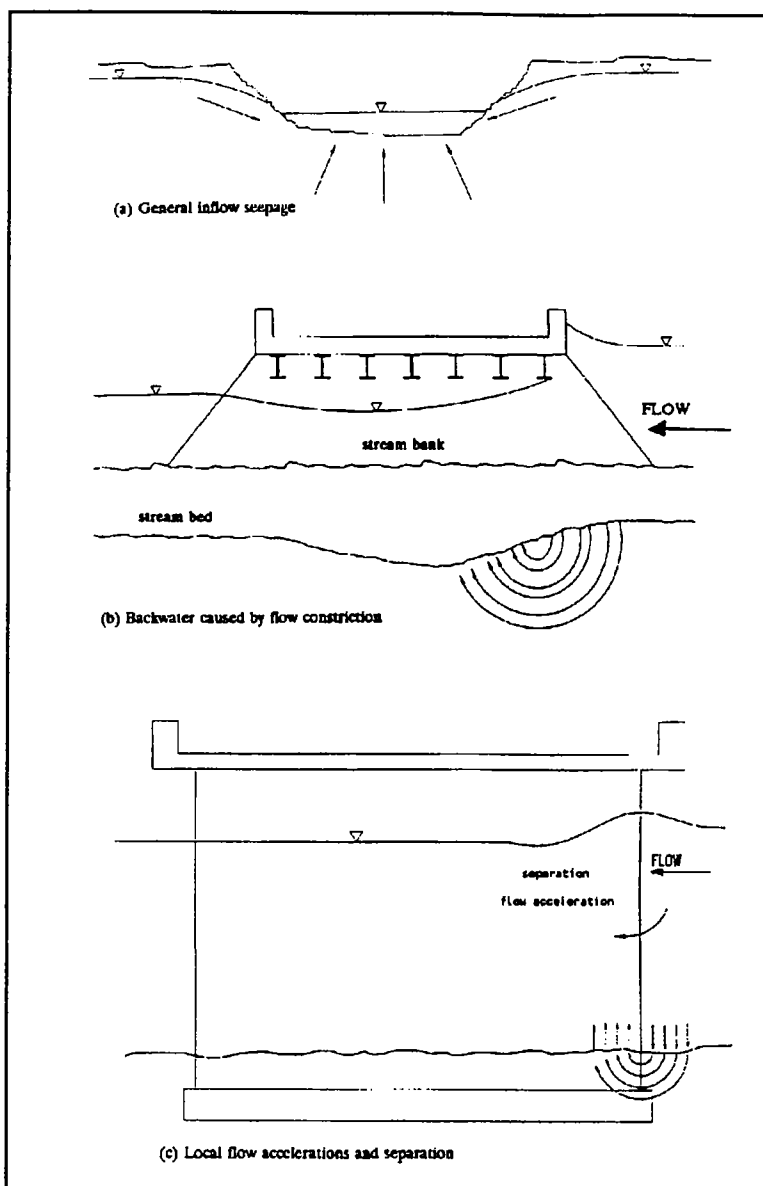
a,b,c: Hydraulic gradients and seepage at bridge crossings.
